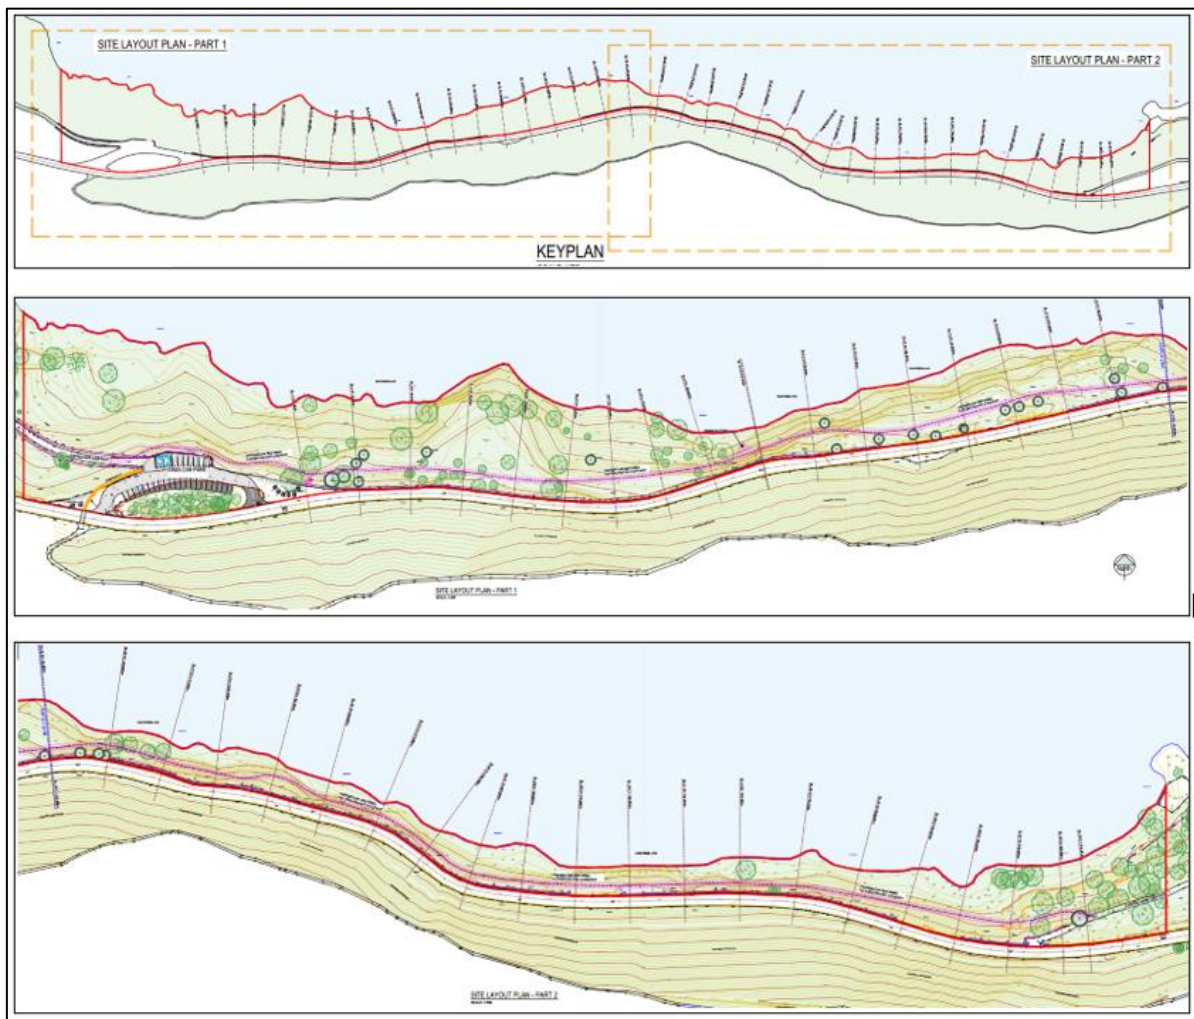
Proposed site layout (extracted from the planning drawings). Top: Full site overview, Middle: Western section, Bottom: Eastern section.
